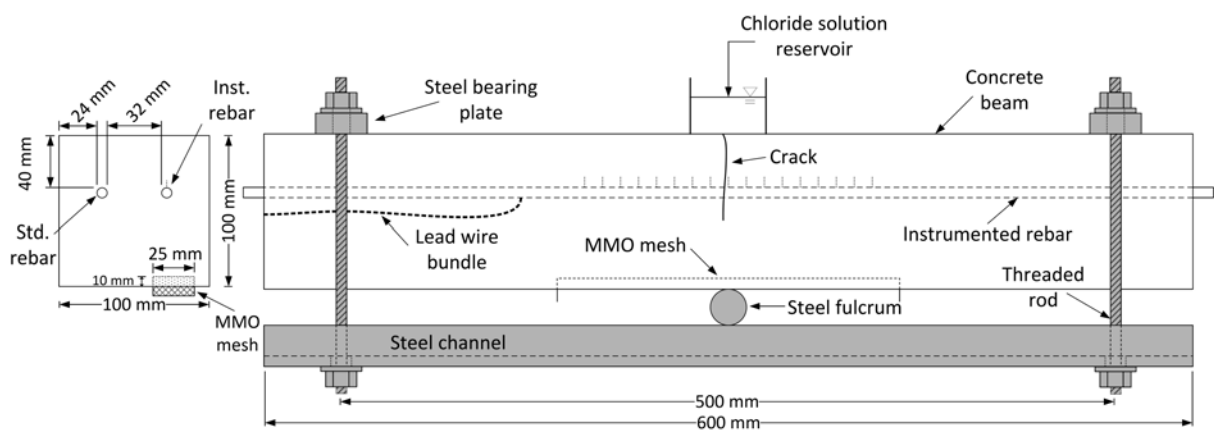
Beam specimen design including instrumented rebar, MMO-Ti mesh, and reservoir for chloride solution. Cracking frame is shown in gray.
